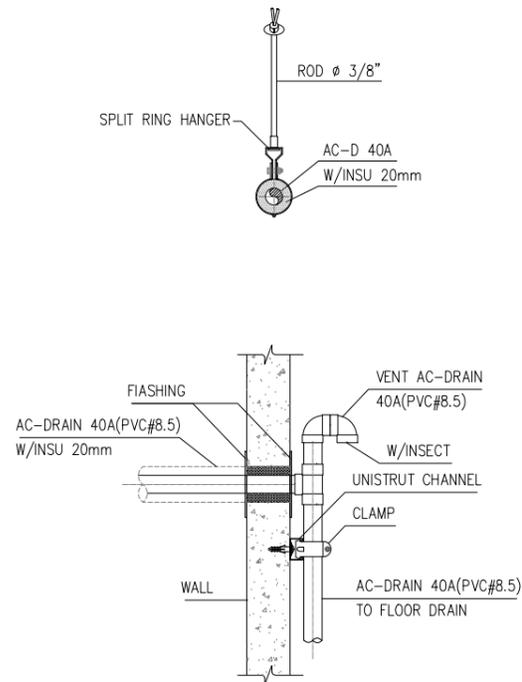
TYPICAL DETAIL FOR REFRIGERANT VRF INSTALLATION
